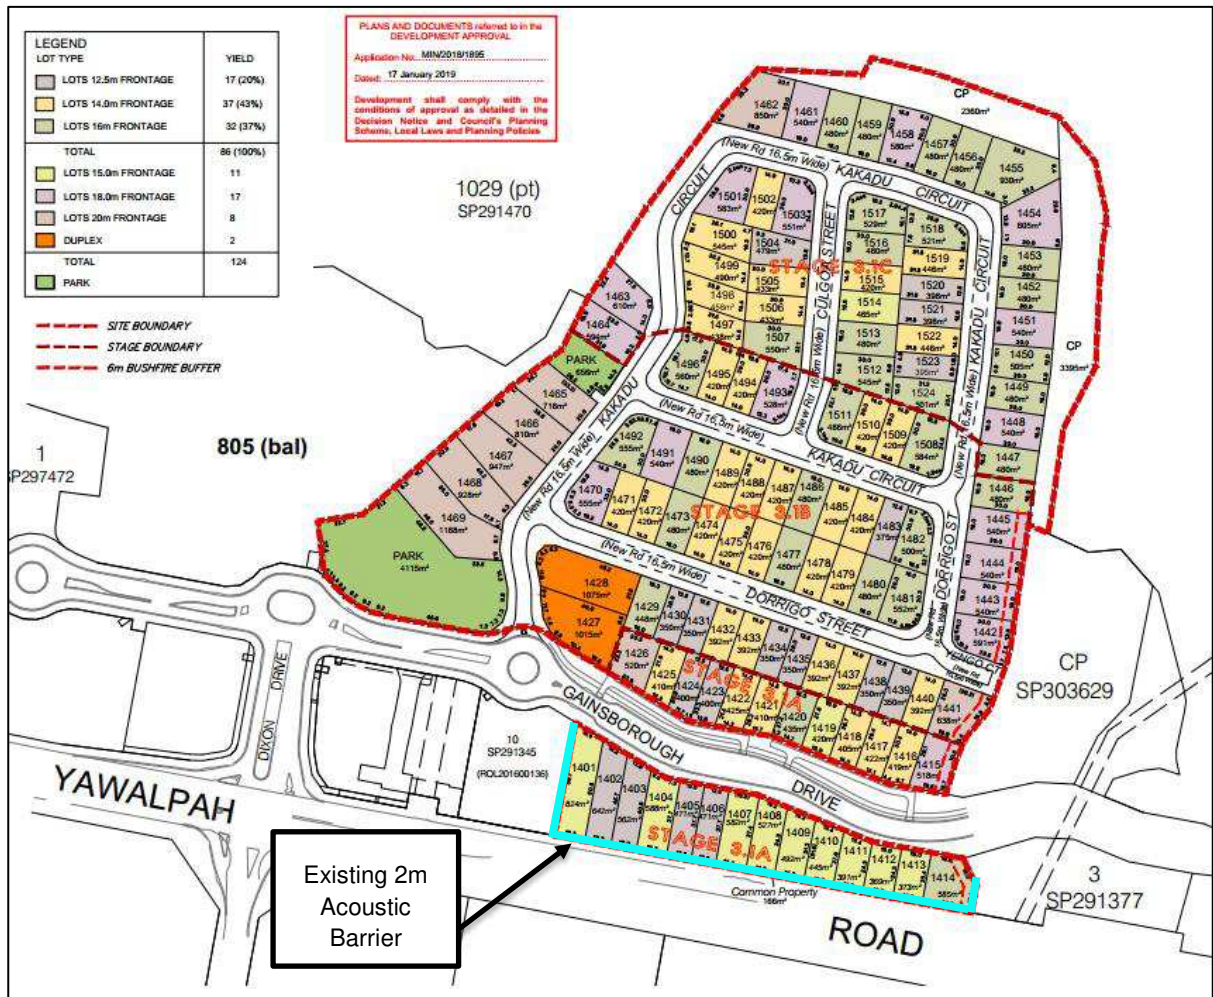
Site Layout and Existing 2m Acoustic Barrier
